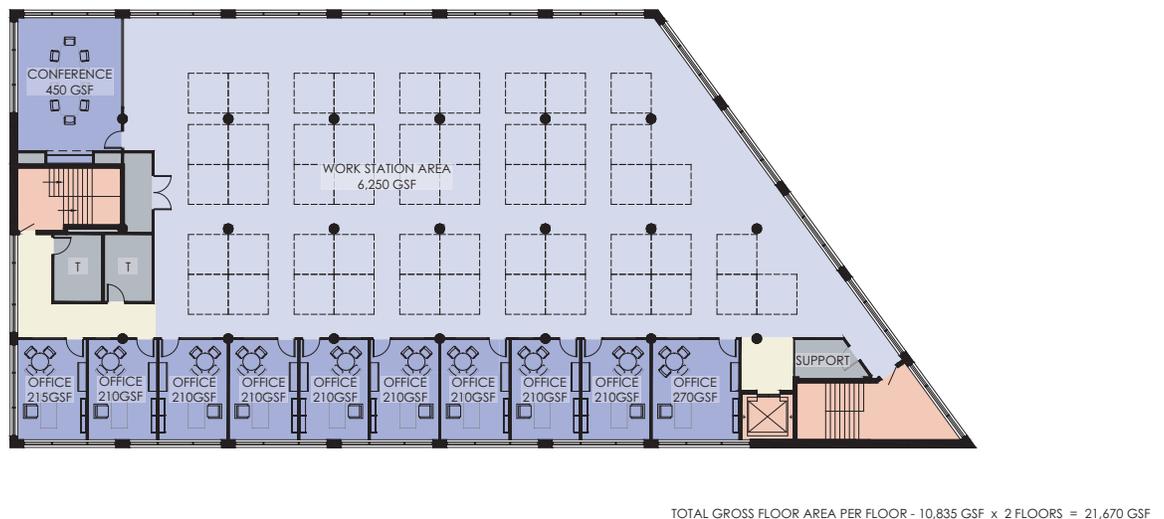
Building 21 - Potential Typical Office Floor Plan (CJS)
